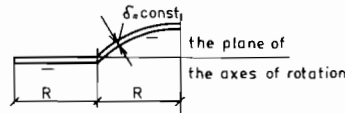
Plane of rotation axes passing through a point of support of the meridional cross section (for constant shell thickness).
